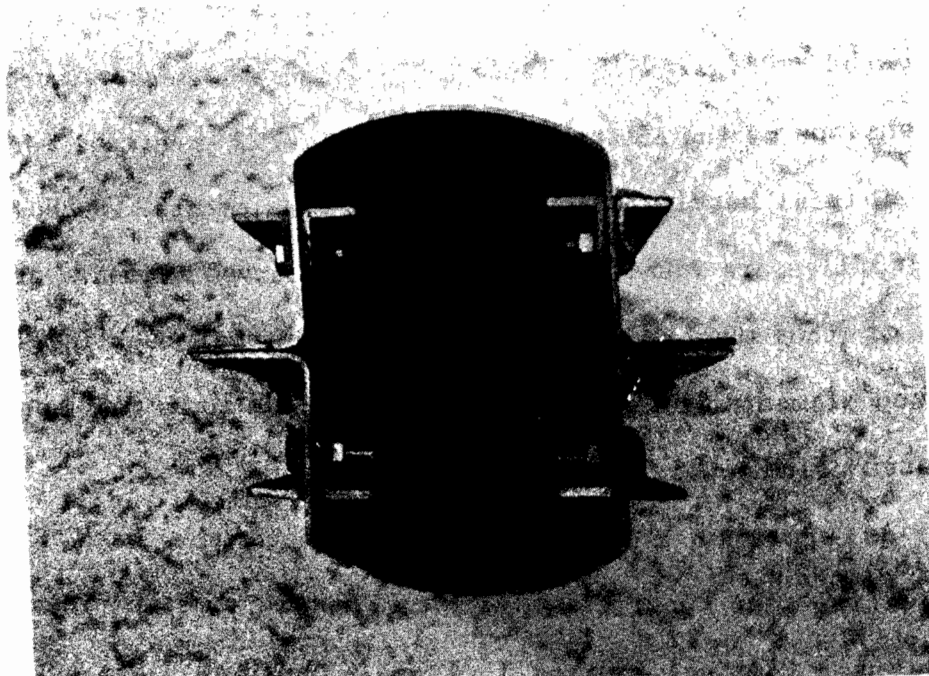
Typical Cross Section for the AS Stub Column Specimens
